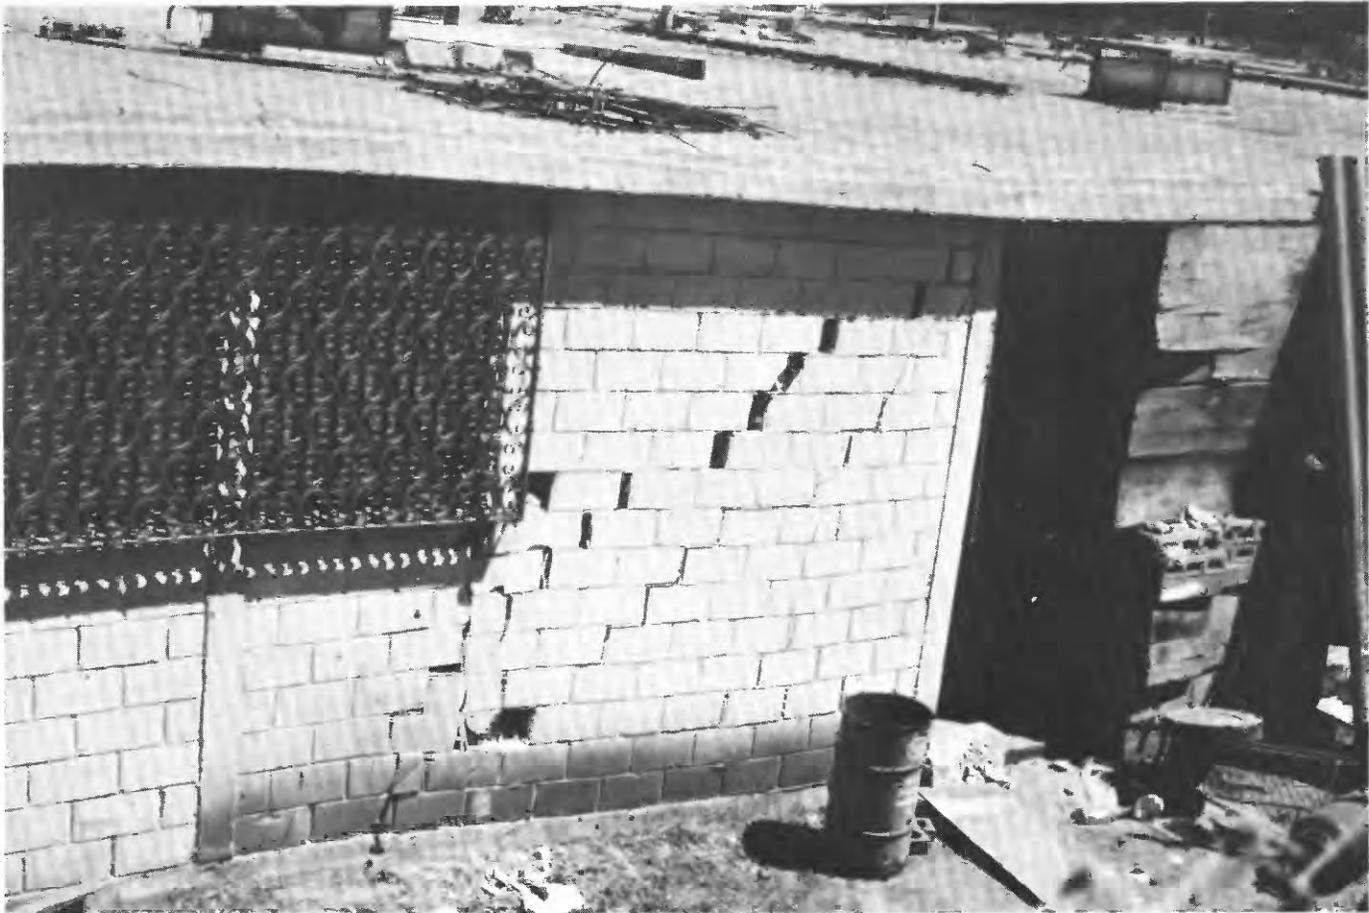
Fault damage to the rear exterior wall and roof of a house in Guatemala City. Vertical displacement near the front of the house was 12 cm.
